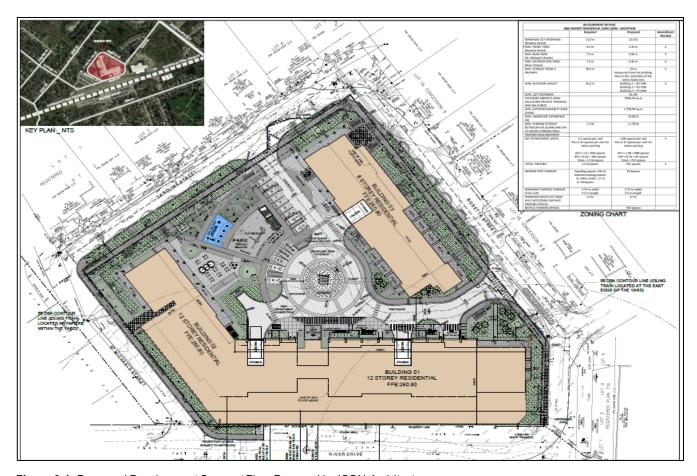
Proposed Development Concept Plan, Prepared by ICON Architects
